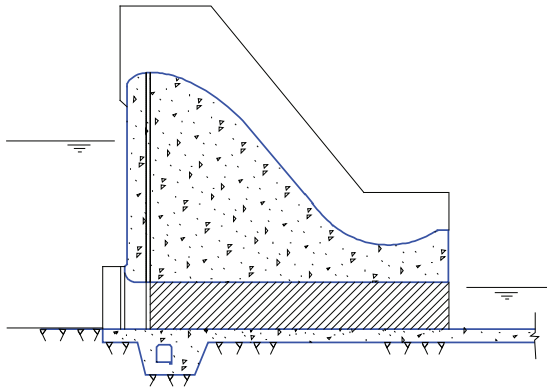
Longitudinal section of a diversion sluiceway in a high ogee spillway.
